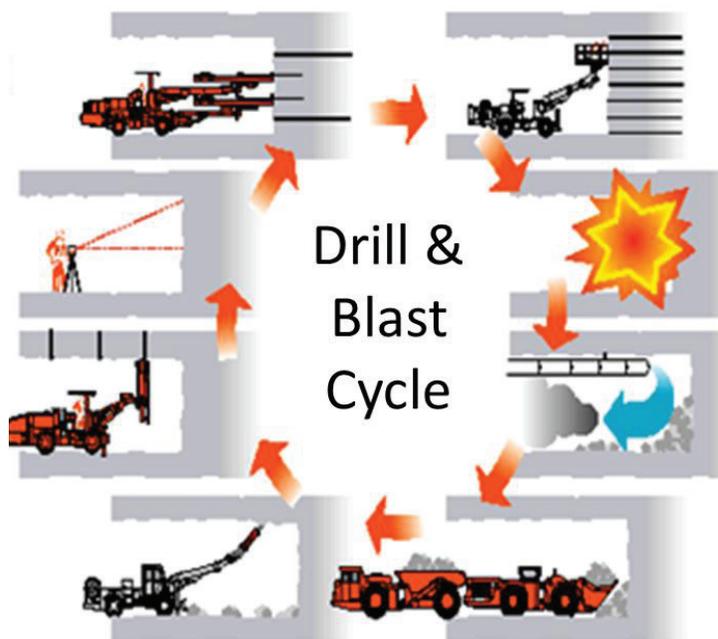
TYPICAL DRILL AND BLAST EXCAVATION CYCLE (COURTESY SANDVIK)
